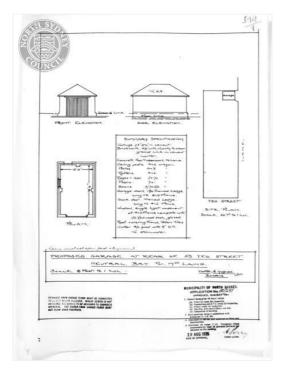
Plan submitted to Council in August 1935, for a new garage facing the side lane, built by Clapton & Hughes, builders (Source: Stanton Image Gallery, Call No. BA 35/281)
